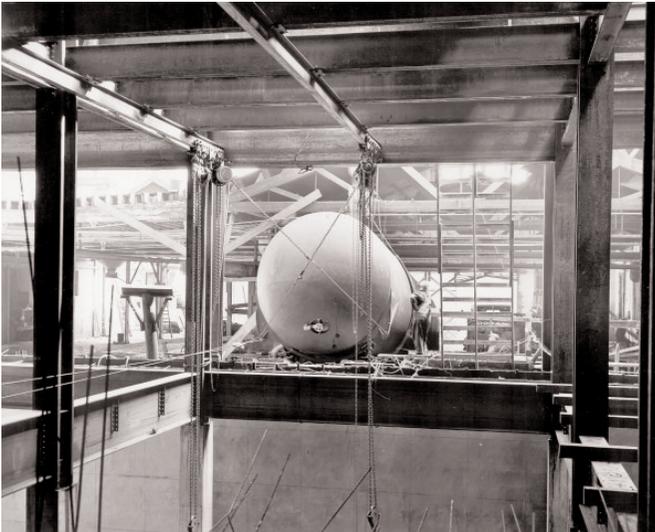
Installing a new storage tank at the Hudepohl Sixth Street brewery, late 1940s. (author's collection)
